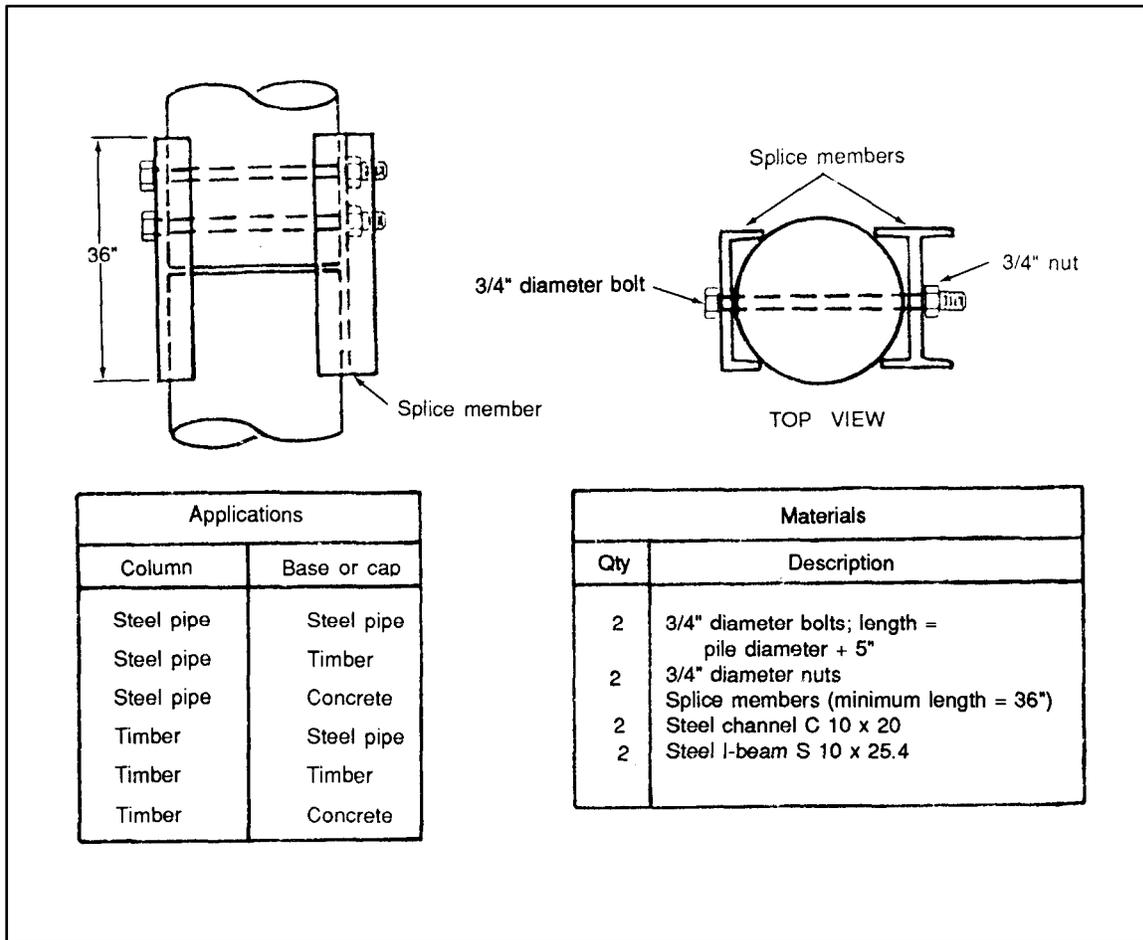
Joining like-diameter piles, column to base or cap connections (connecting method 2)
